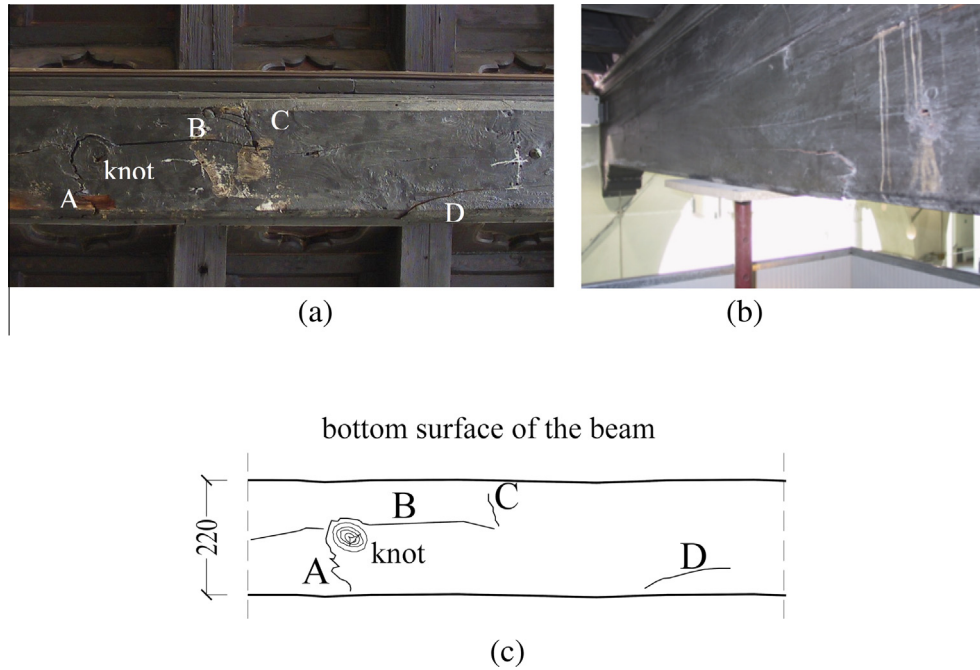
Details of splitting cracks at the beam soffit (a), on the beam's southern side (b) and crack pattern on the beam's bottom surface (c).
